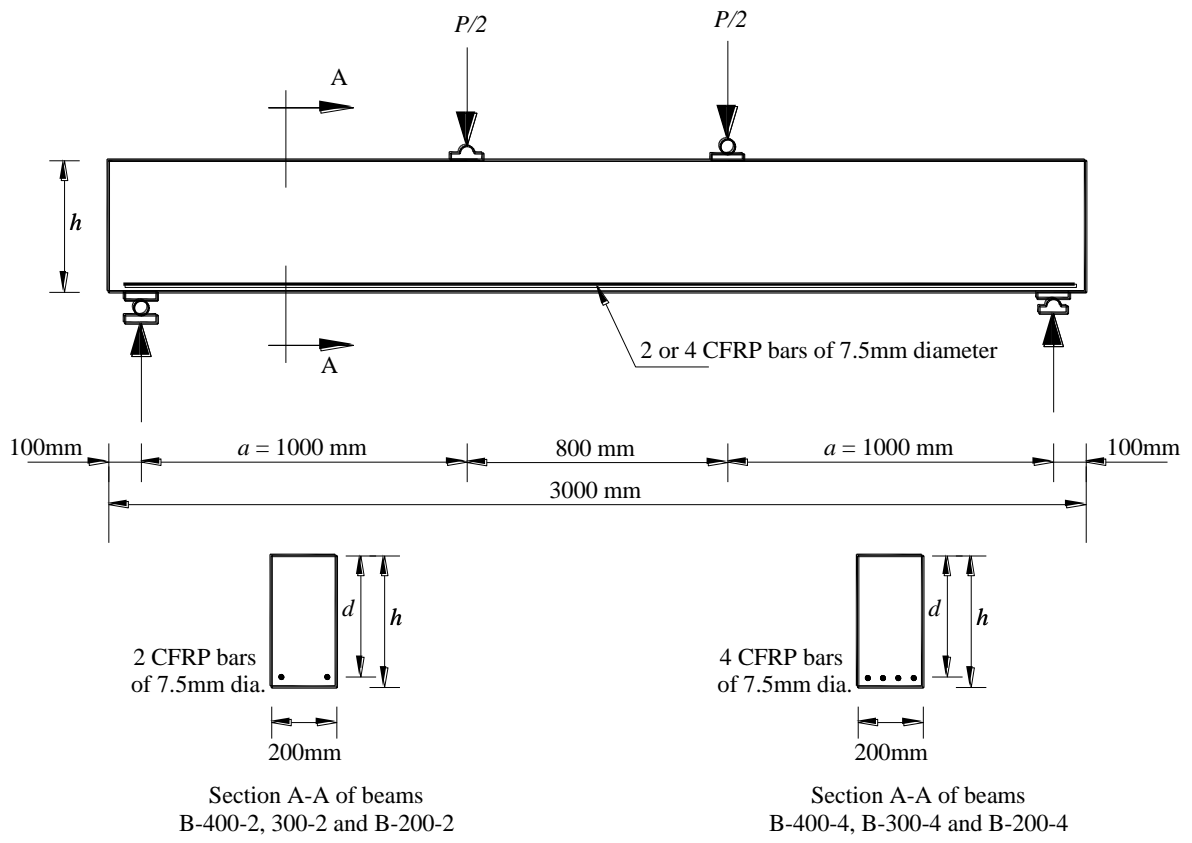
Geometrical dimensions and reinforcement details of test specimens
